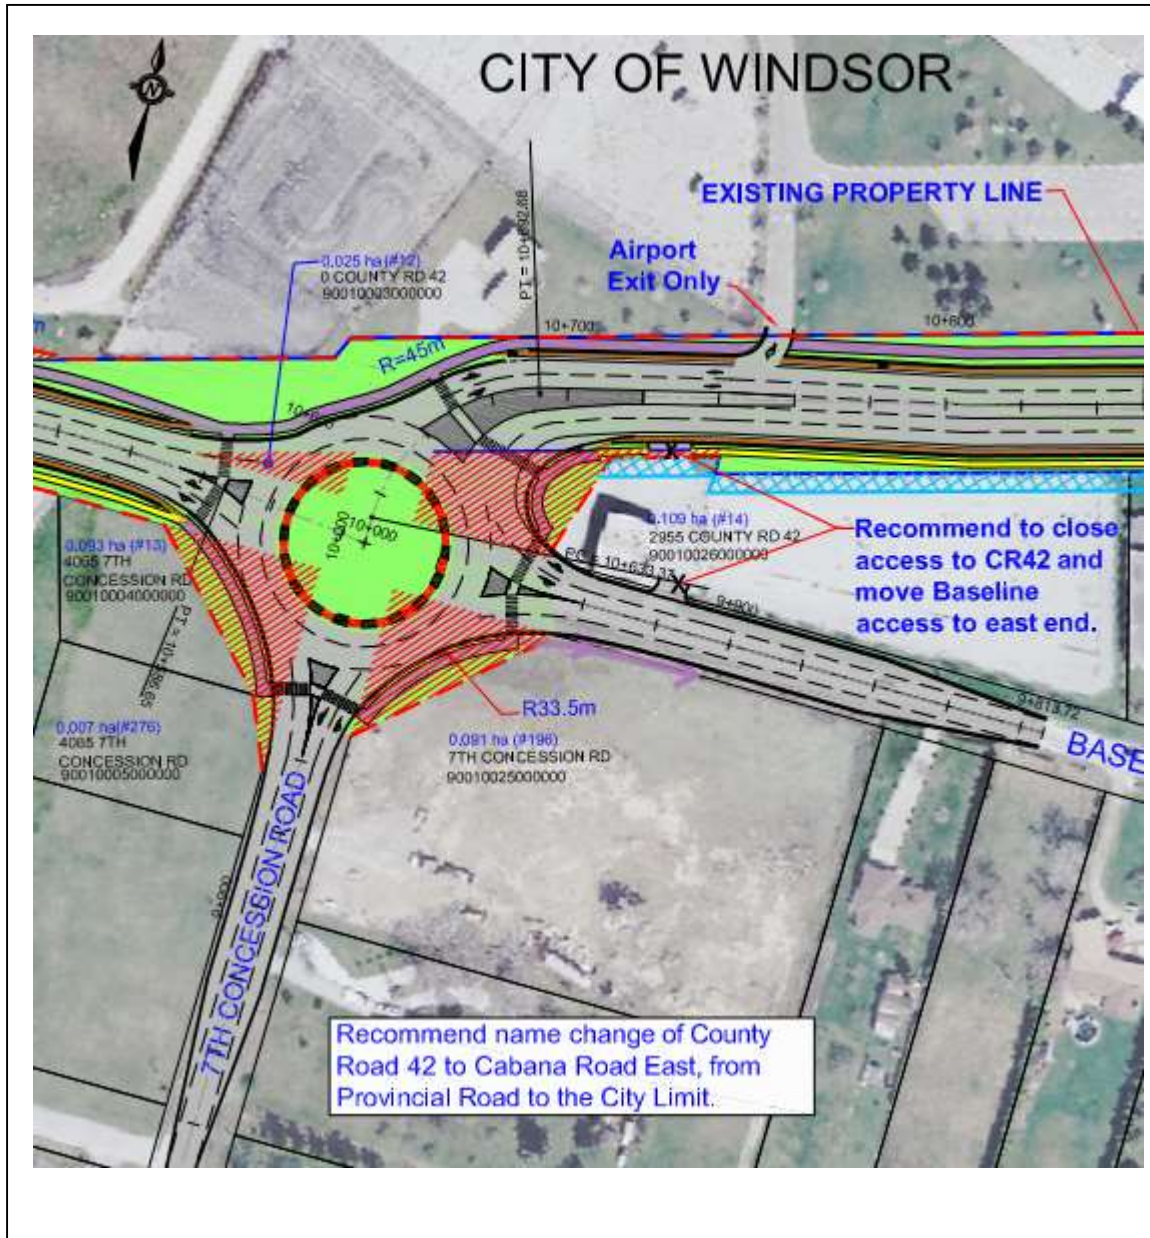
Lauzon Parkway Improvement EZ – Portion of Plate 2
